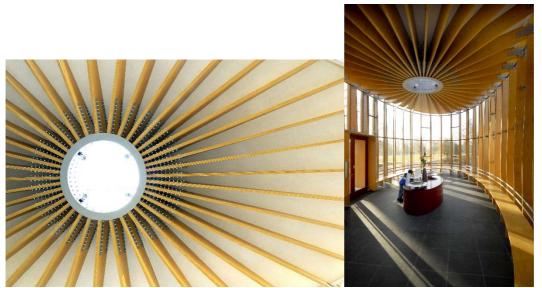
Kurpark Wuellpavillon (Bode Petters Architekten) in Germany uses Kerto-Q in radial rafters and wall columns. Photo: Hanns Joosten.
